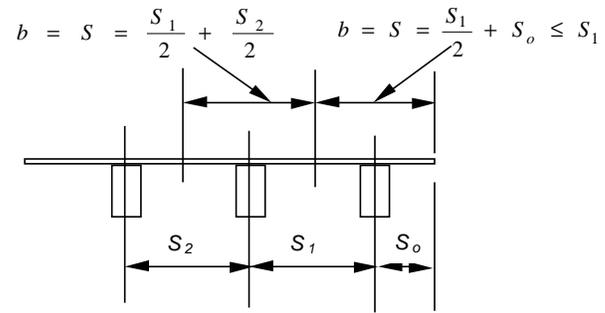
Girder Spacing and Full Flange Width.
